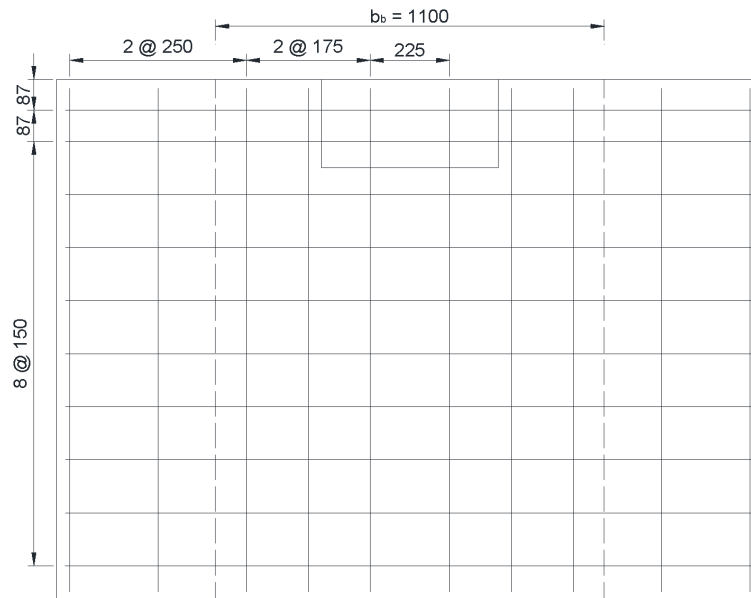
Top mat reinforcement details for Specimen 1 (15M bars) (units in mm)
